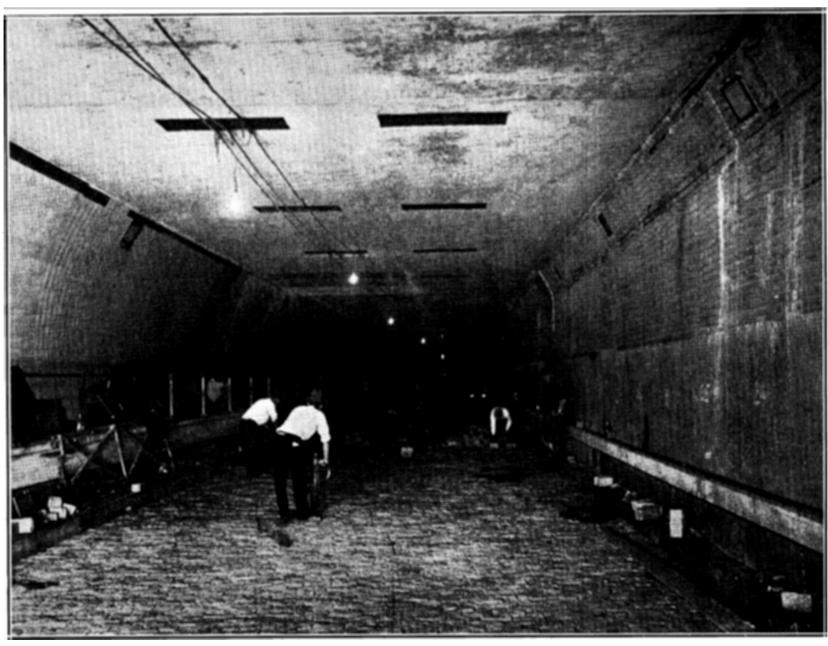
Laying Granite Block Pavement. Contract No. 10.
